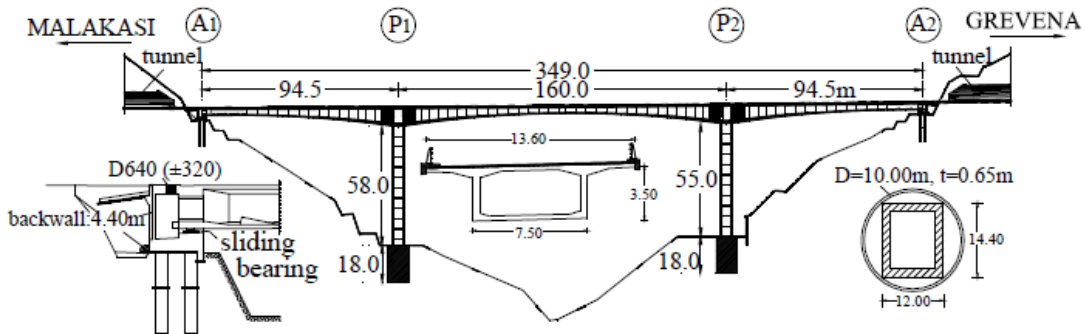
Longitudinal section of Malakasi-Grevena bridge and the cross sections of the abutment, the deck at the mid-span and the pier.
